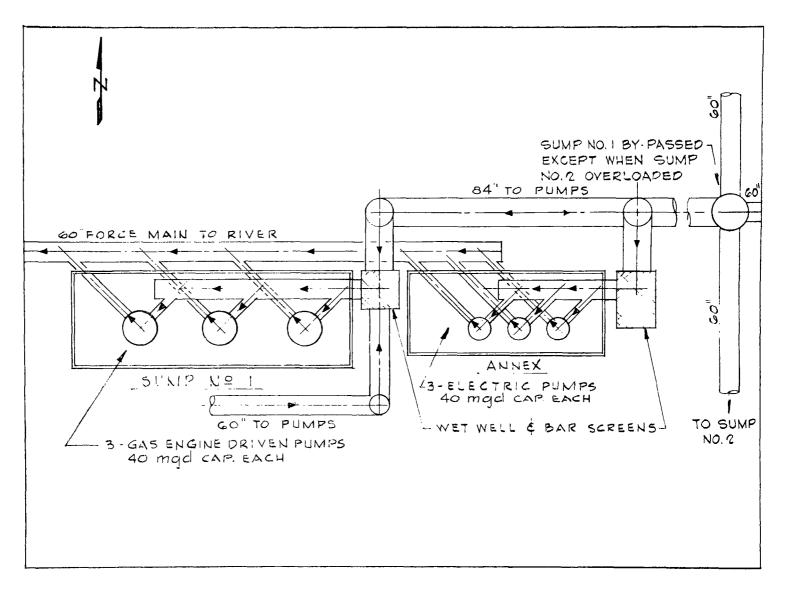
SCHEMATIC PLAN - SUMP NO. 1
